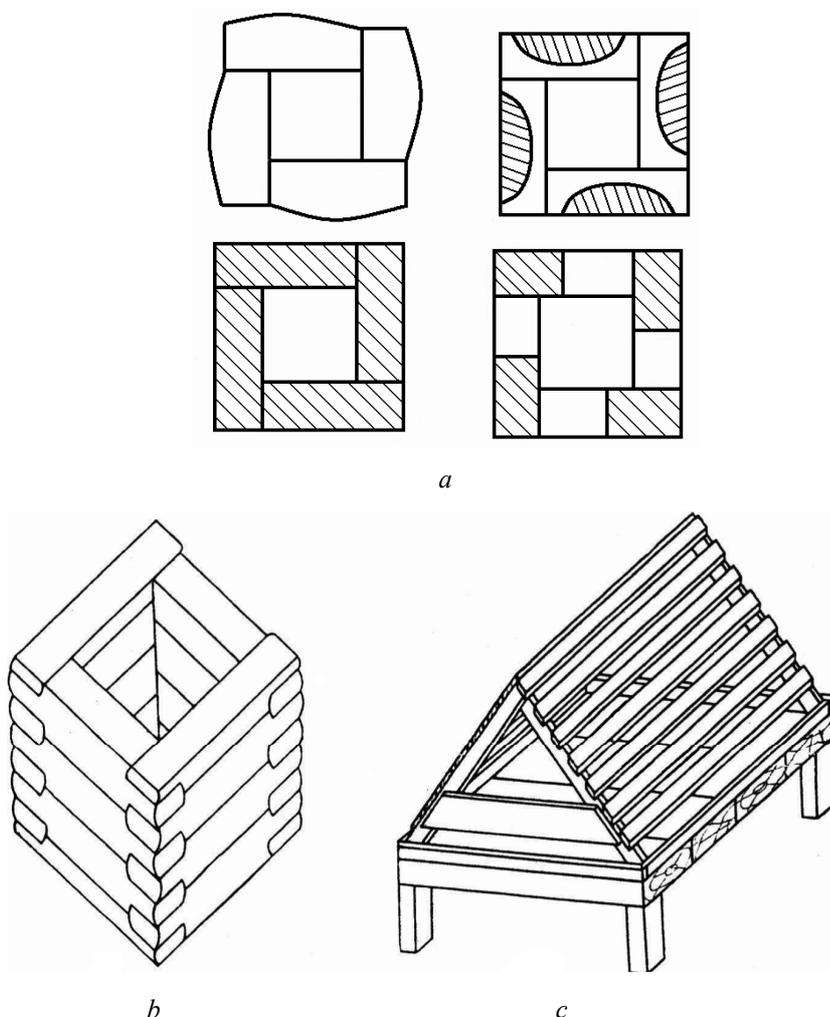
Scheme of model tests of flame retardant properties of flame retardant solutions (fire retardants): a – the method of the timber pipe (shaded TPZ in the details of the model, non-shaded lightly permeated zone – LPZ); b – well method (well); c – method of the “overlap – roof” model
